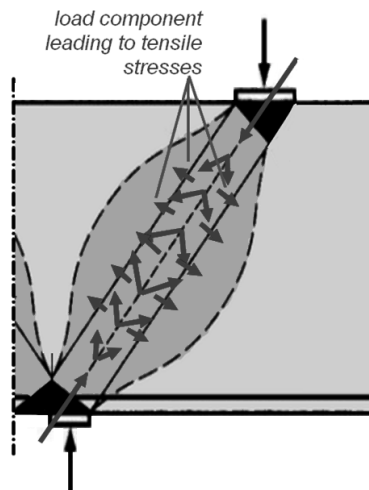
Tensile stresses in a bottle-shaped truss, causing cracks
